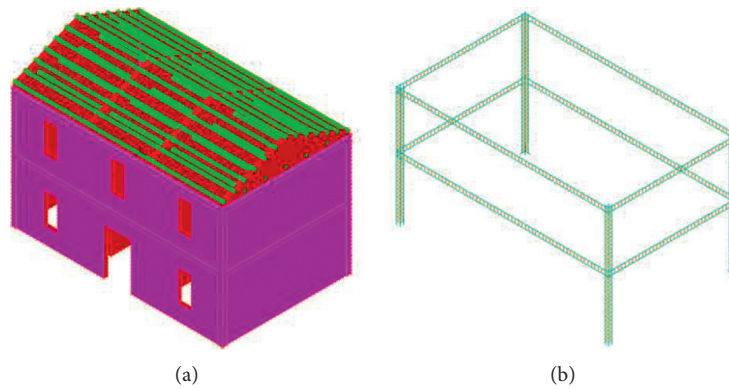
Numerical model of brick-wood structure after reinforcement. (a) House model. (b) Layout of steel bars.
